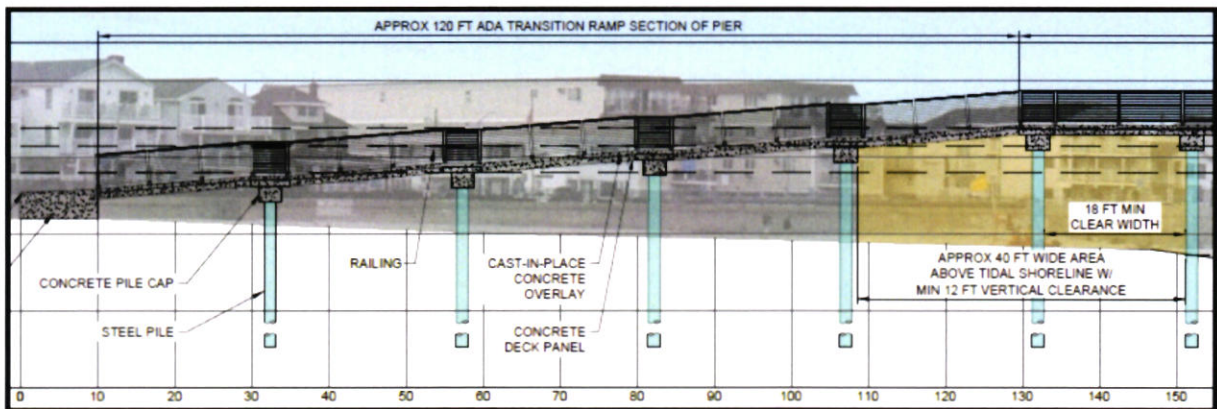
Proposed Precast Concrete Pier Profile Off Seawall
